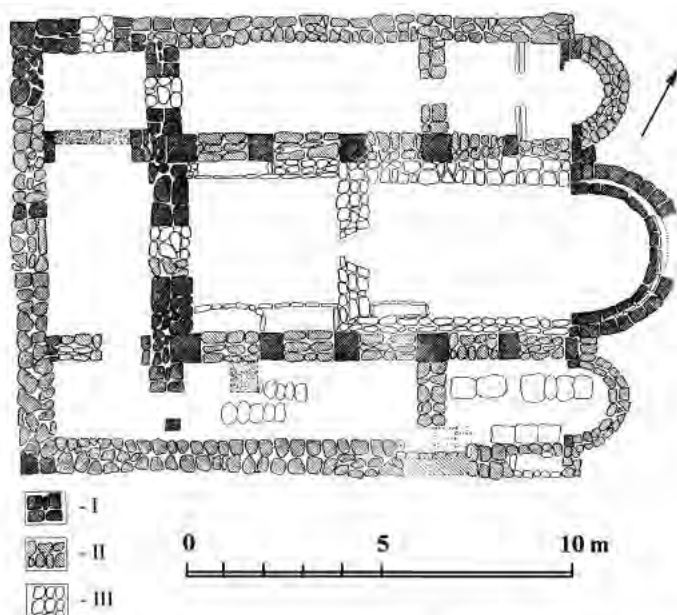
Christian Basilica in Partenit. Excavation Plan (after N. Repnikov [91, fig. 6]). The flanking apses, walls between the piers, blocked doorways and other repairs are later changes and additions.
